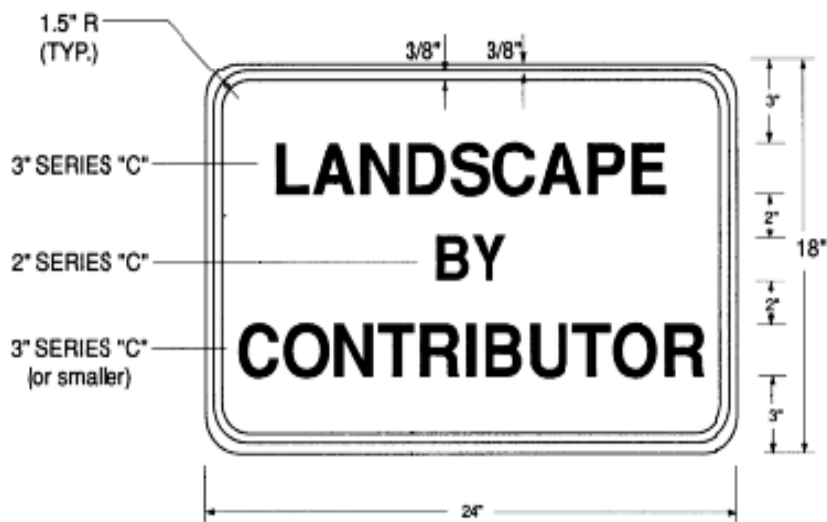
Arterial and Limited Access Landscape Roadway Sign
